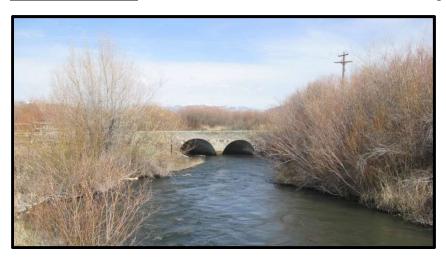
Undersized culvert across the Pahsimeroi River at Dowton Lane was a partial barrier to fish passage.
